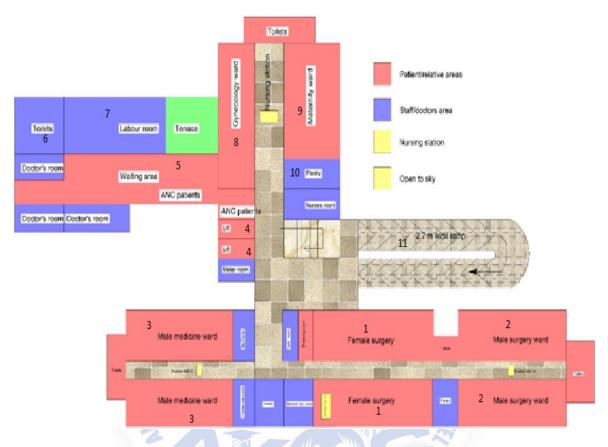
SECOND FLOOR PLAN (CIVIL HOSPITAL ALIBAG)
